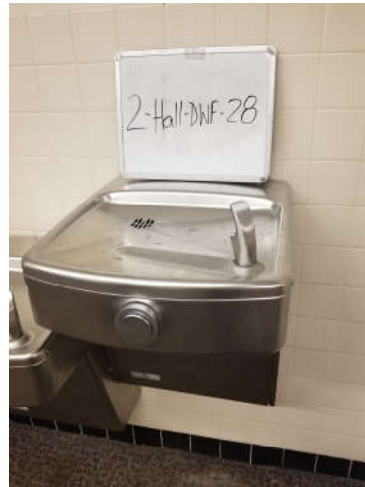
Drinking water faucet, located on the 2nd floor in hallway.
